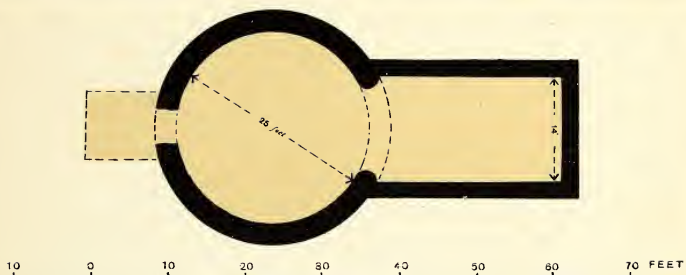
Plan of a round-naved parish church at West Thurrock, Essex.
